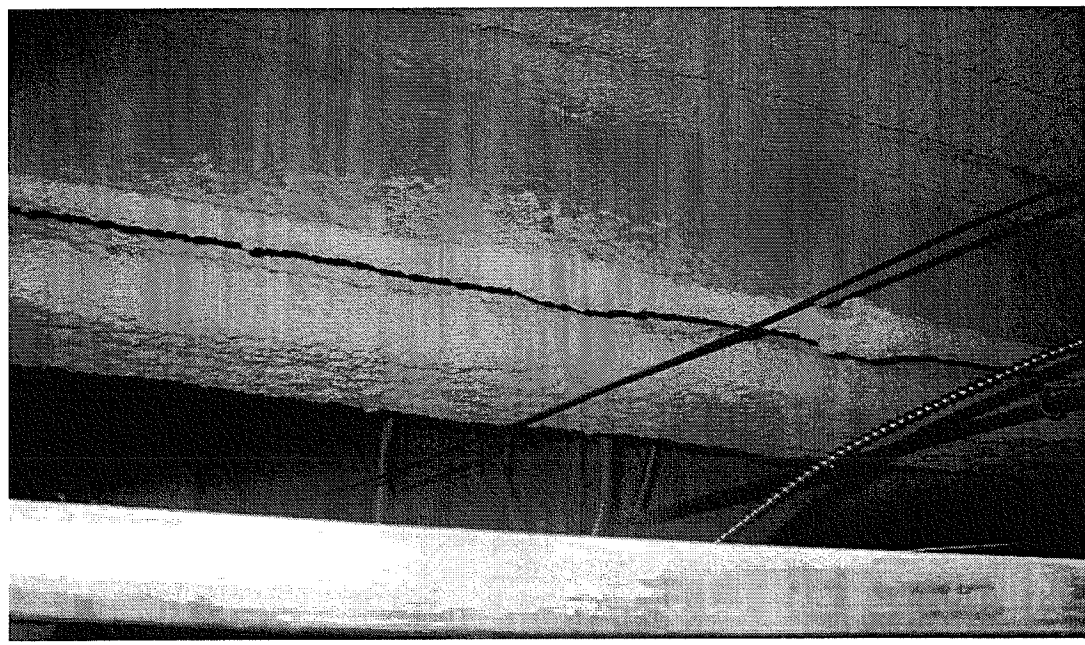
View of fireproofed I-beams and metal pan decking above suspended ceiling
